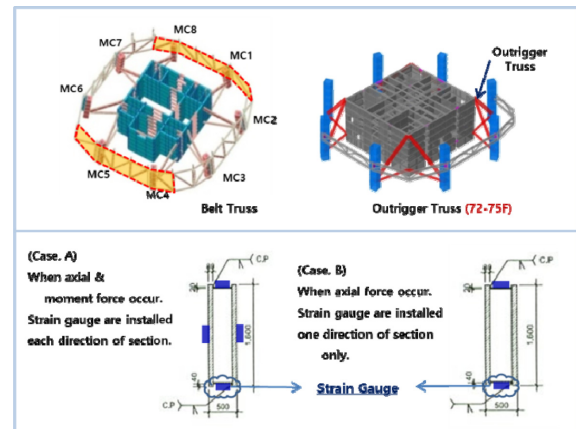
Installed location of strain gauges on Outrigger and Belt truss.
